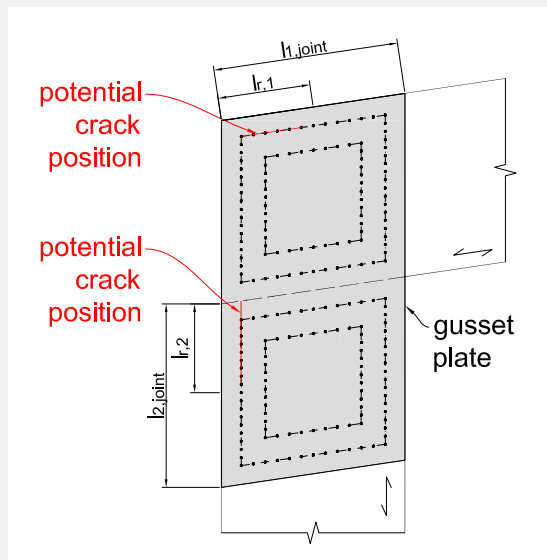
Possible crack locations joint (gravity load case) in a typical portal knee with gusset plates with small diameter dowel type fasteners.
